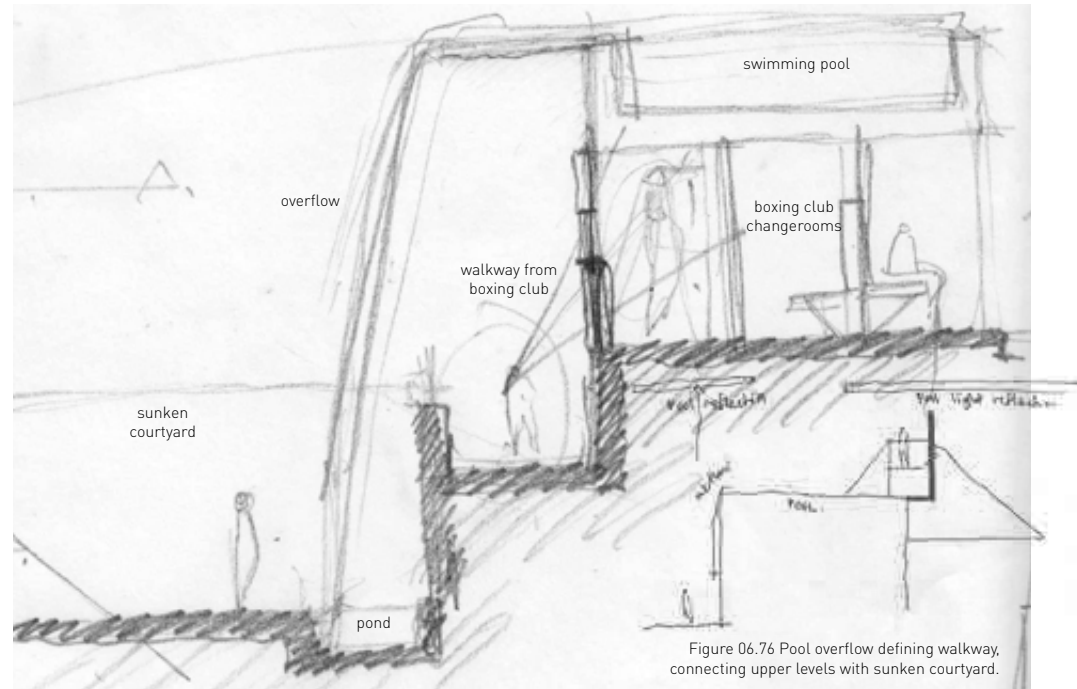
Pool overflow defining walkway, connecting upper levels with sunken courtyard.
